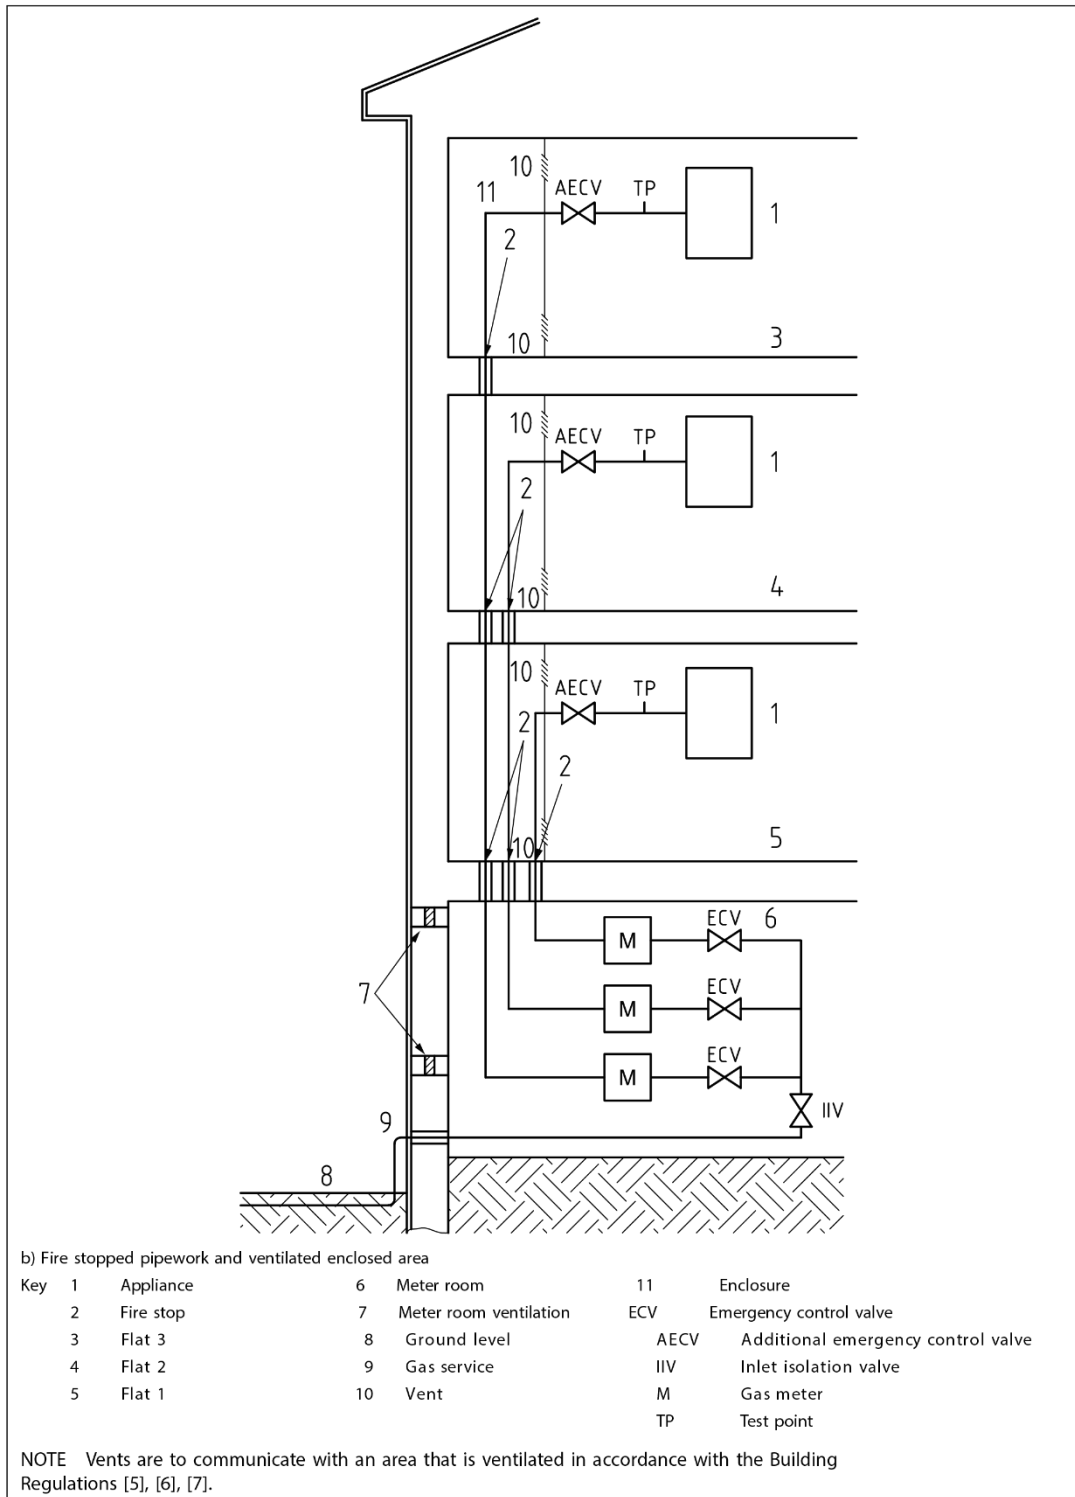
Typical pipework in multi-story buildings containing flats or maisonettes
